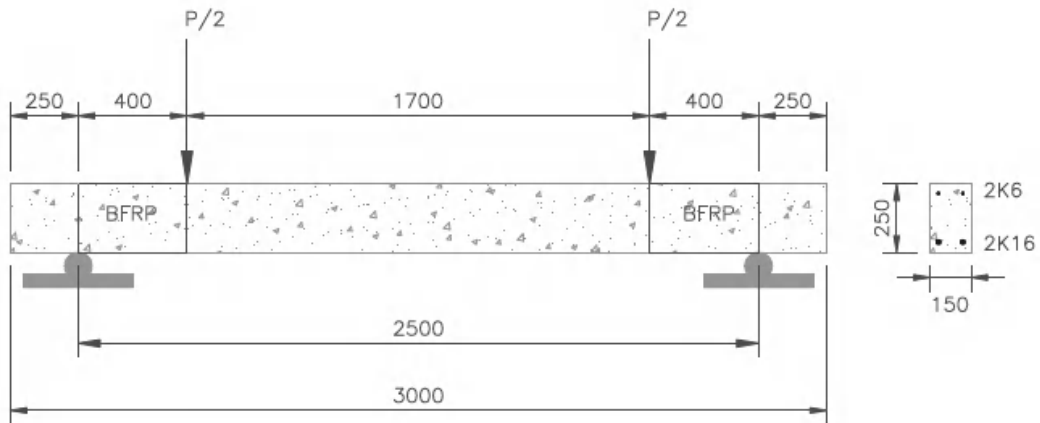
Beams in group a and b. Strengthened for shear with epoxy as an adhesive.
